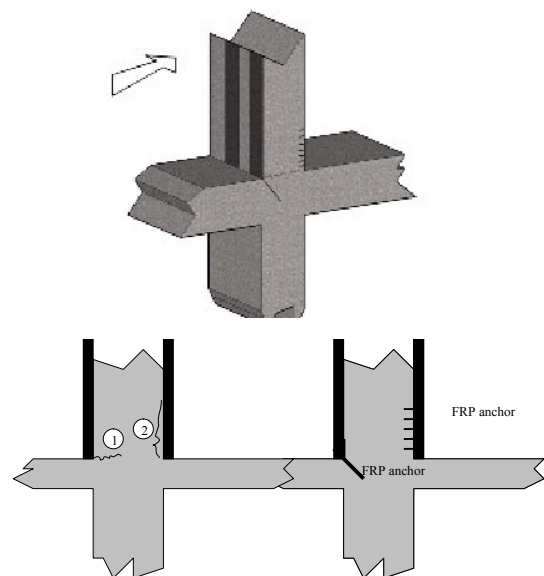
Reinforced column beam junction. Cracking pattern and anchorage system
